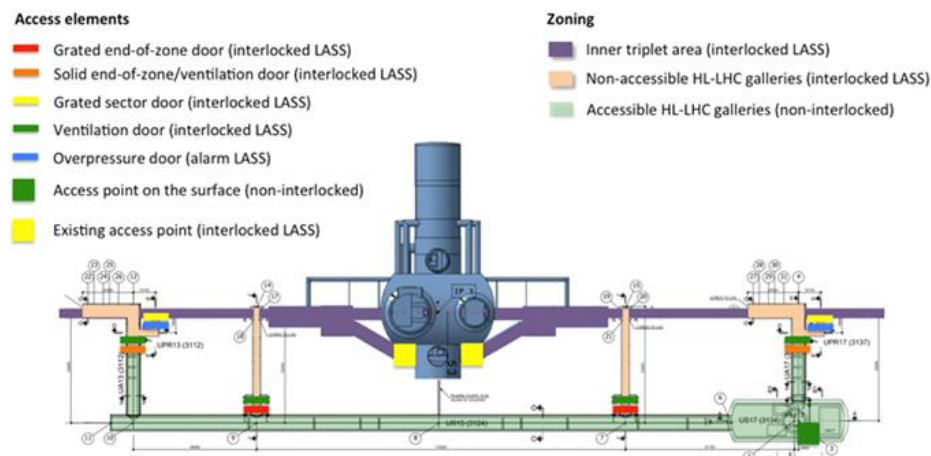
Underground access zoning and access elements at Point 1. Zoning of Point 5 will be similar as applicable with the exception of existing access point and service tunnel locations.
